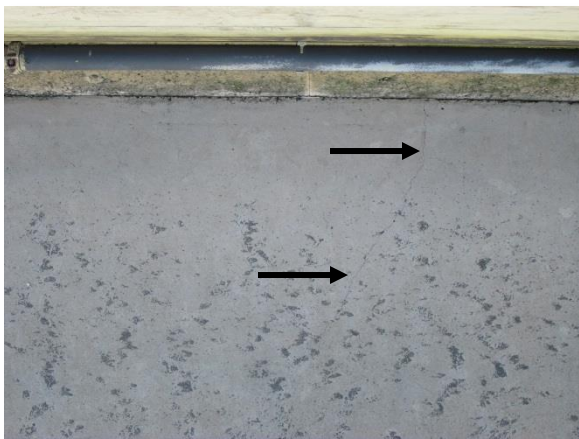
Crack in floor near east wall (north is to left in photo).
